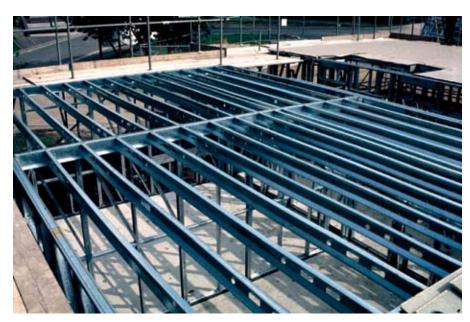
Light steel floor joists supported on Z sections positioned over load-bearing light steel walls
